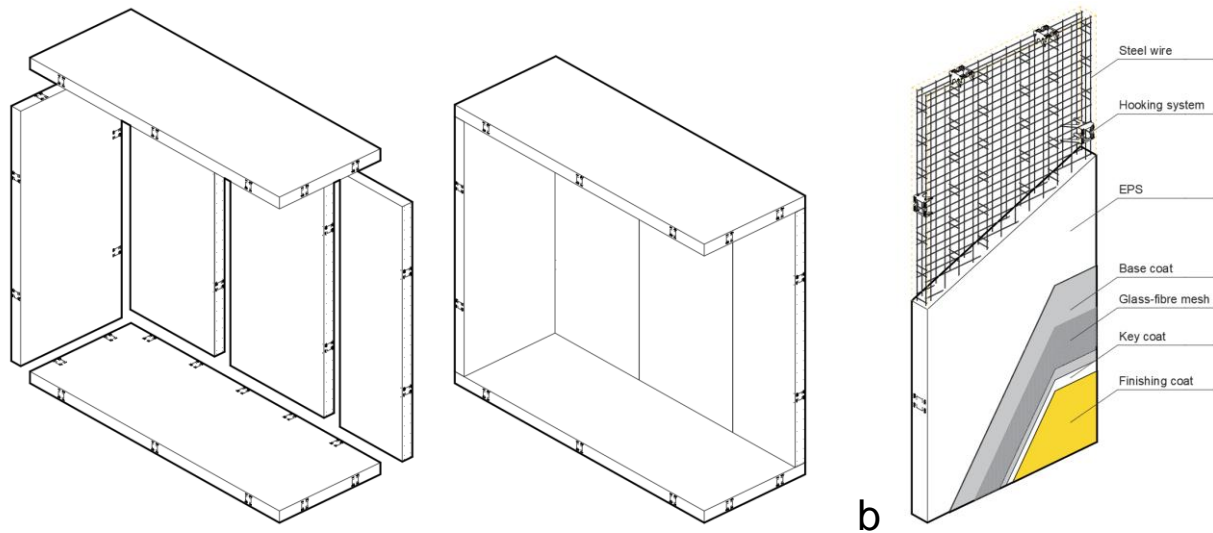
a) Axonometric view of the assembly process of reinforced-EPS panels; b) axonometric view of reinforced-EPS panels adopted in this study with the description of the multi-coat rendering system.
